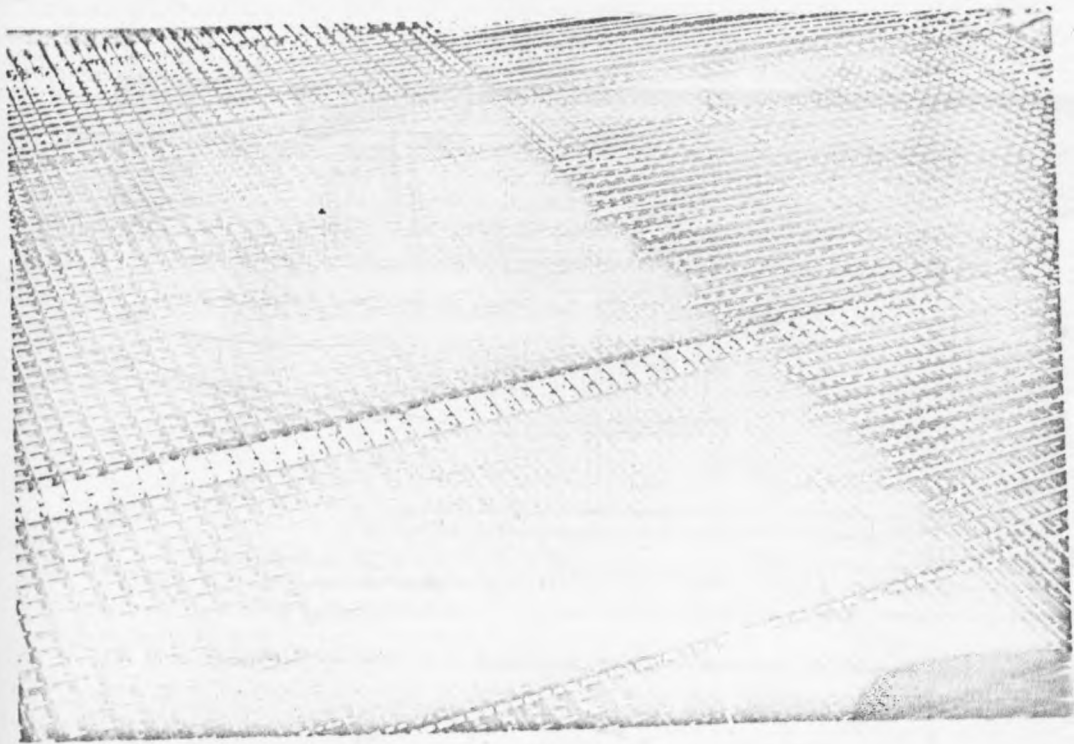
DETAIL OF BASE REINFORCEMENT UNDER REACTOR
